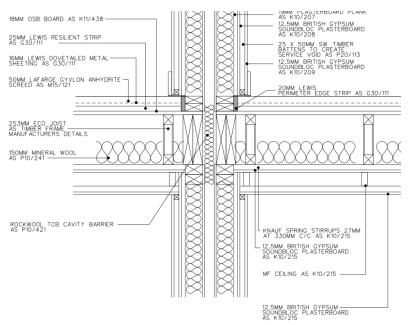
Detail of floating screed on Lewis decking on resilient strips on timber floor
